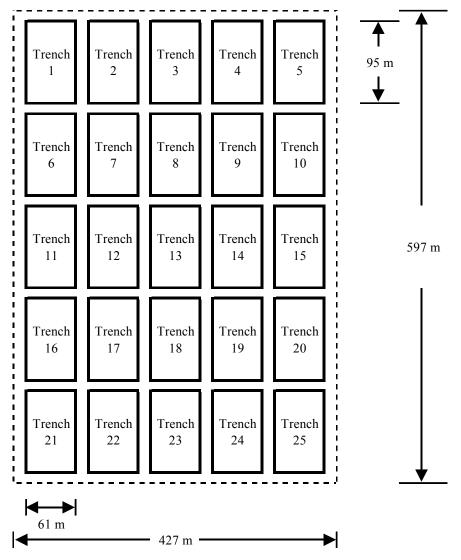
Site Map and Land Area for Operation of the Engineered Trench Disposal Facility: New Inventory, 30-Gallon Drums (not to scale)
